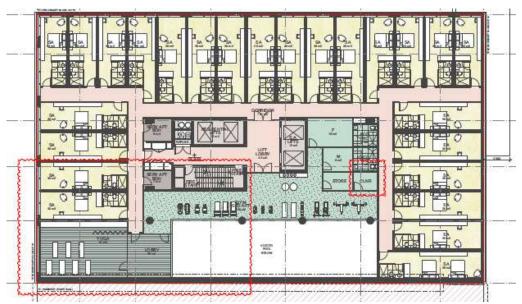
Amended plans - Level 2: Serviced Apartment gym, Yoga Studio and void to pool below
